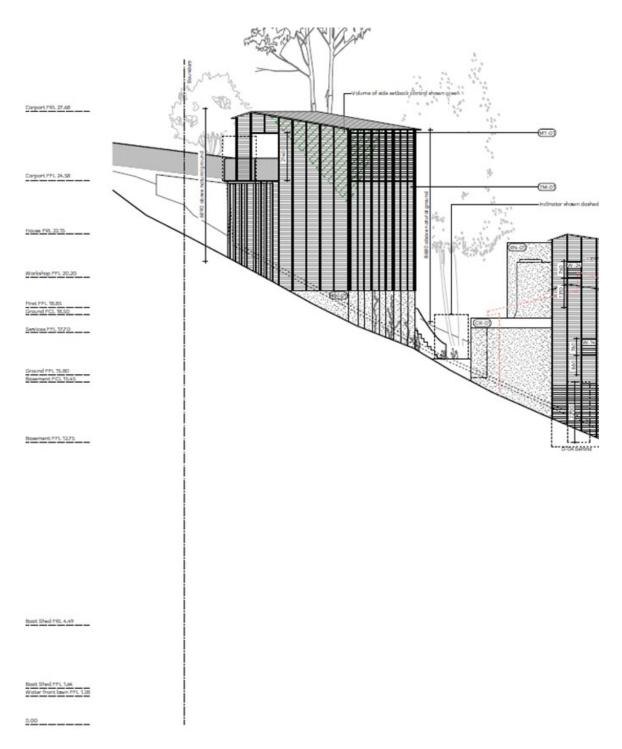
Extent of non-compliance with the side building envelope at the northern elevation (shown in green cross-hatch)
